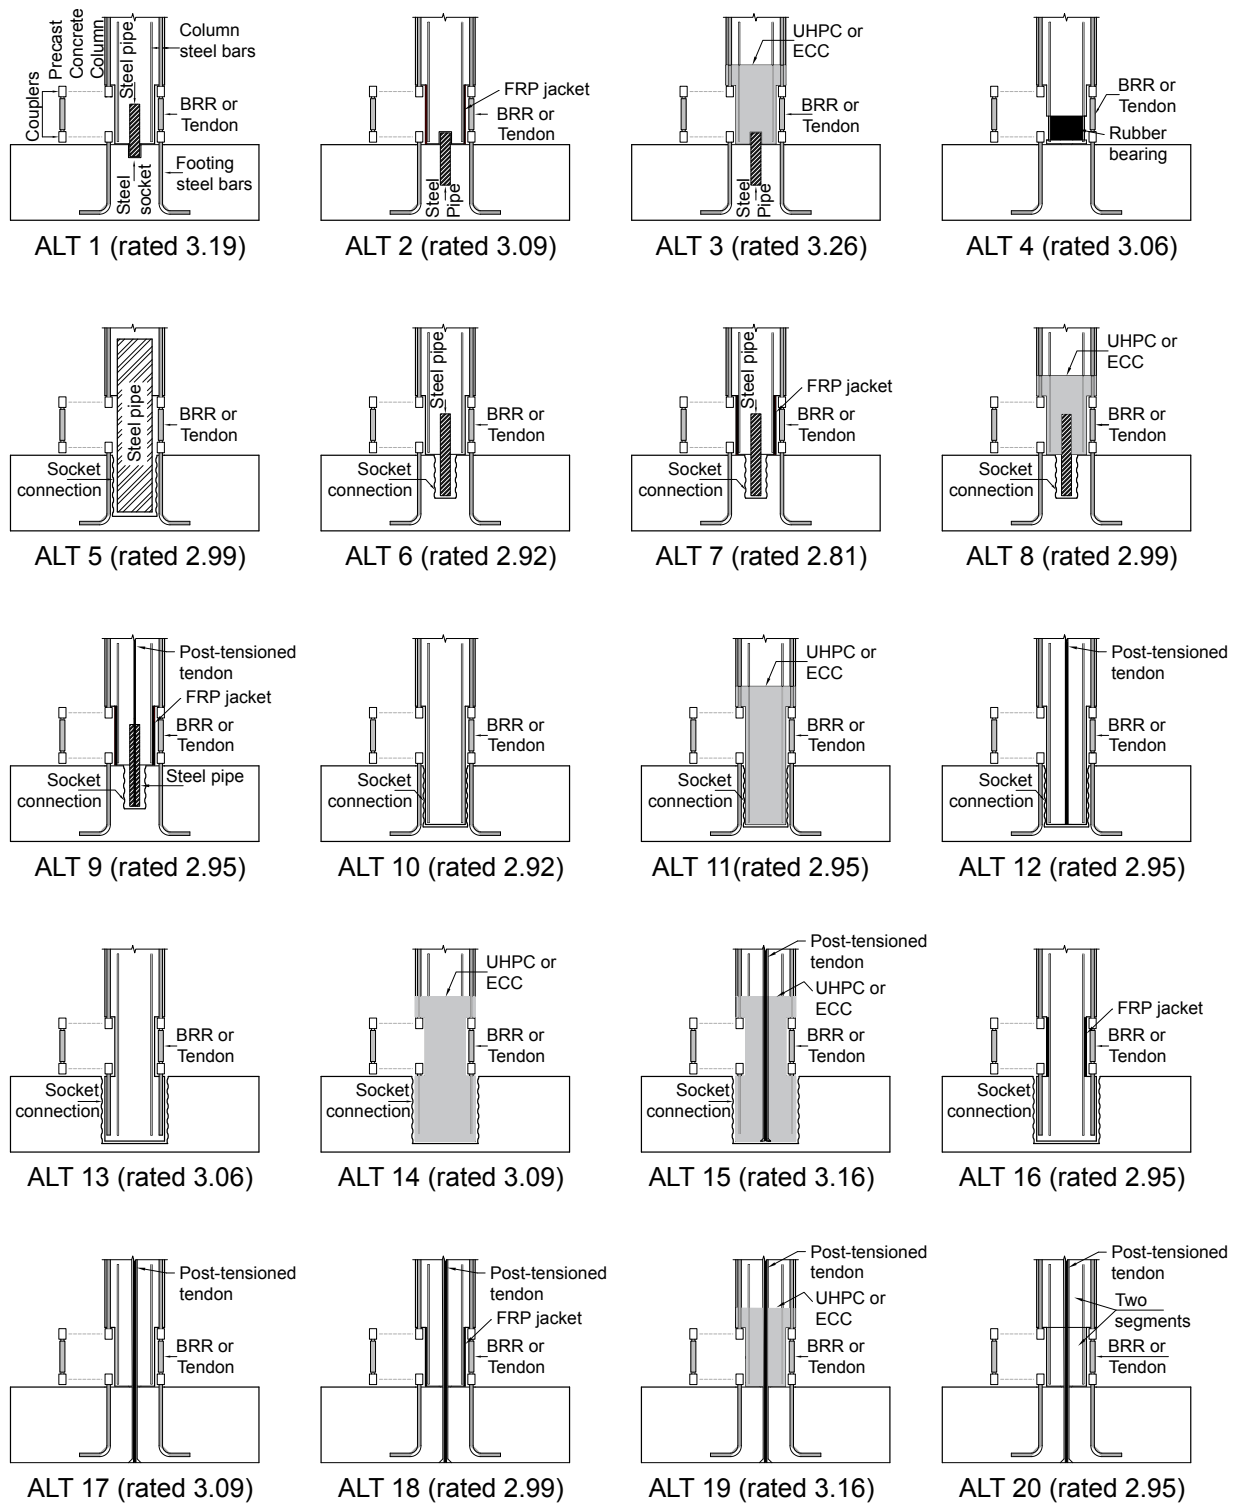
Twenty detailing alternatives and ratings for repairable precast concrete bridge columns. Note: BRR = buckling-restrained reinforcement; ECC = engineered cementitious composites; FRP = fiber-reinforced polymer; UHPC = ultra-high-performance concrete.
